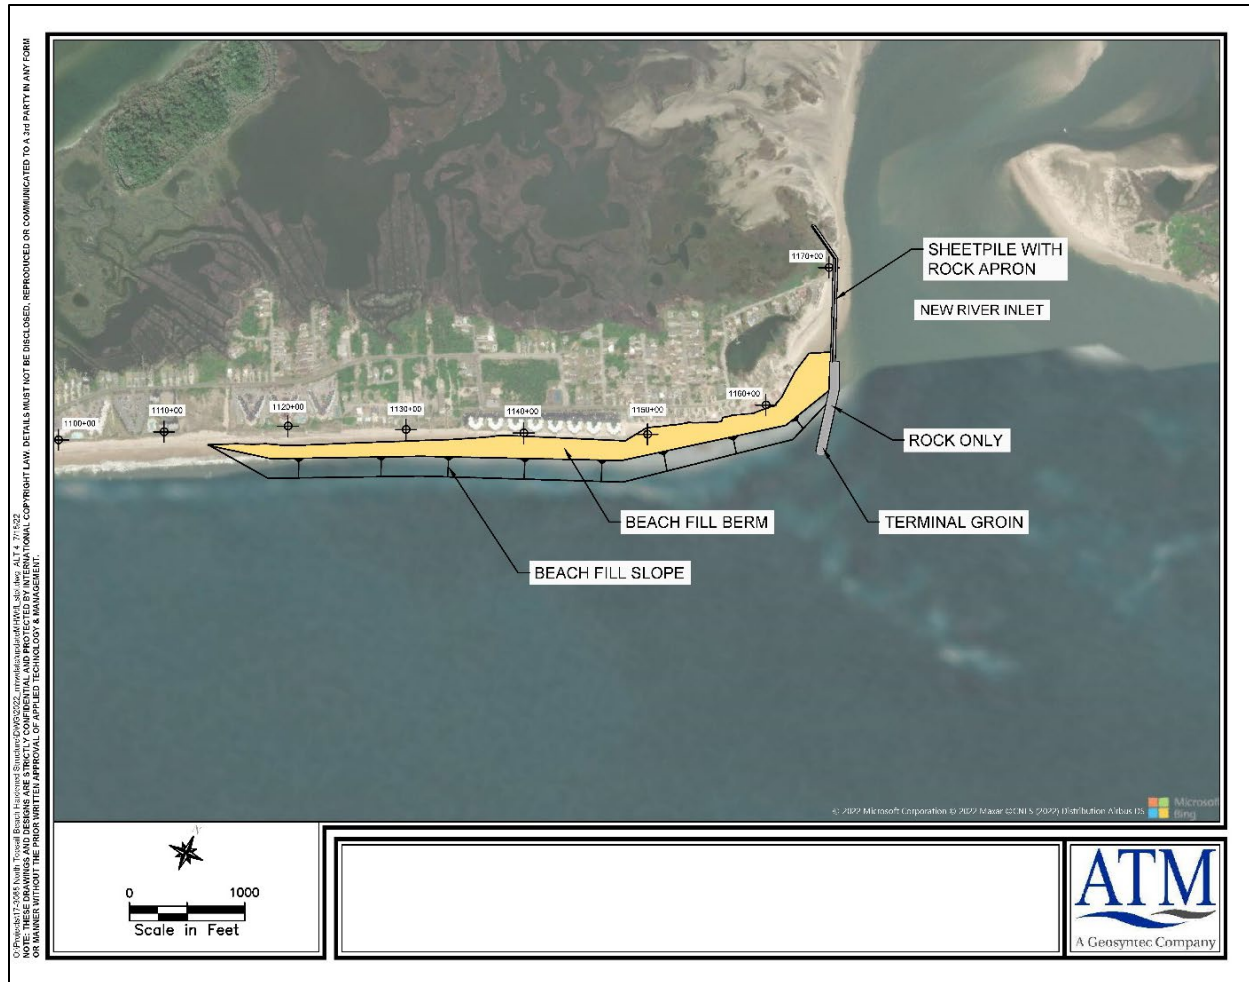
Alternative 4 Terminal Groin and Beach Fill Layout
